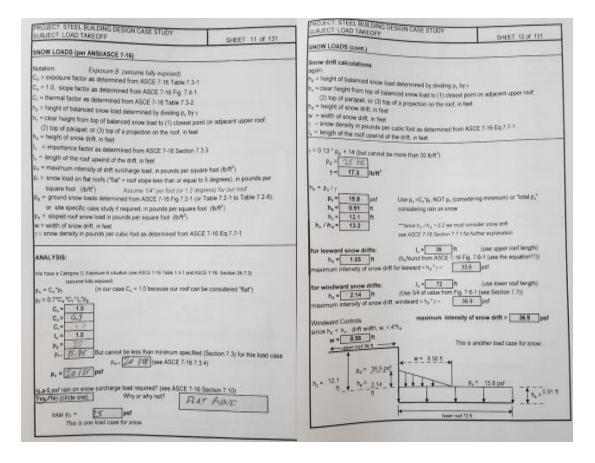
Load takeoff lab exercise for determining snow loads in the steel design course.
